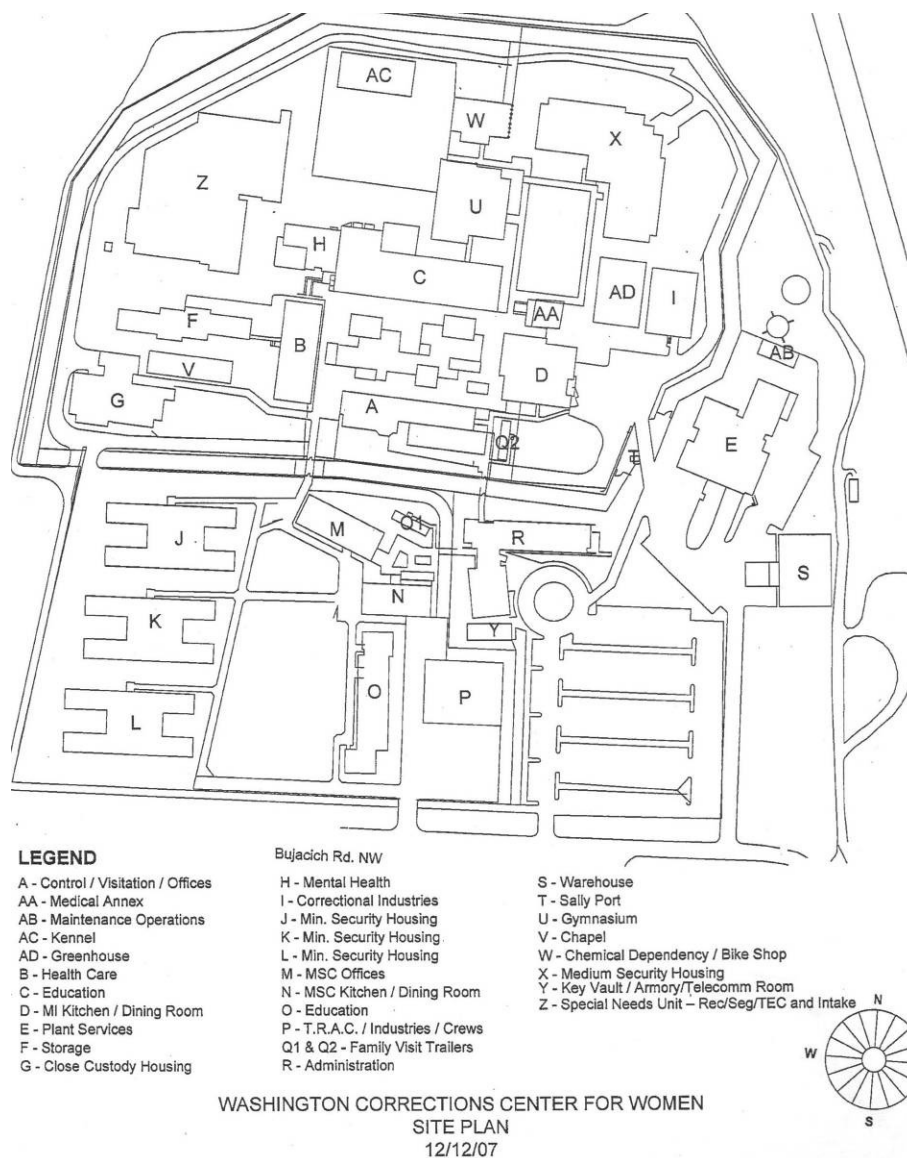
Site plan of WCCW provided to me by staff at the Centre.
